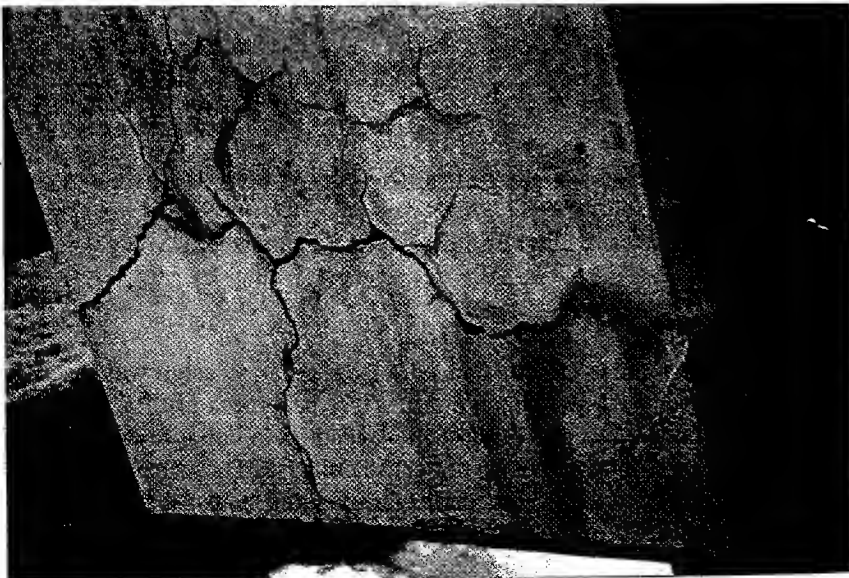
Cracks in a bridge member due to rusting of the reinforcement
